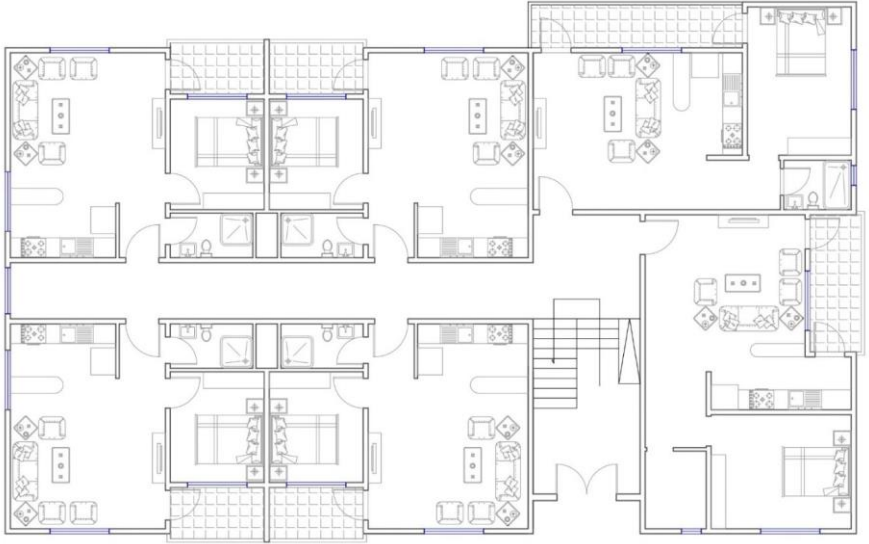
Architectural plan for the first and second models - the floor contains 6 apartments with an approximate area of 52 m² (BABULI, 2021)
